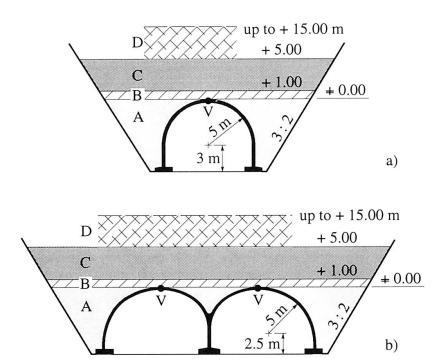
Geometry of the profile and the computed backfilling stages A to D. The design charts refer to the cross-section at the crown of the arch (point V).a) Two track tunnel b) Twin tube tunnel
